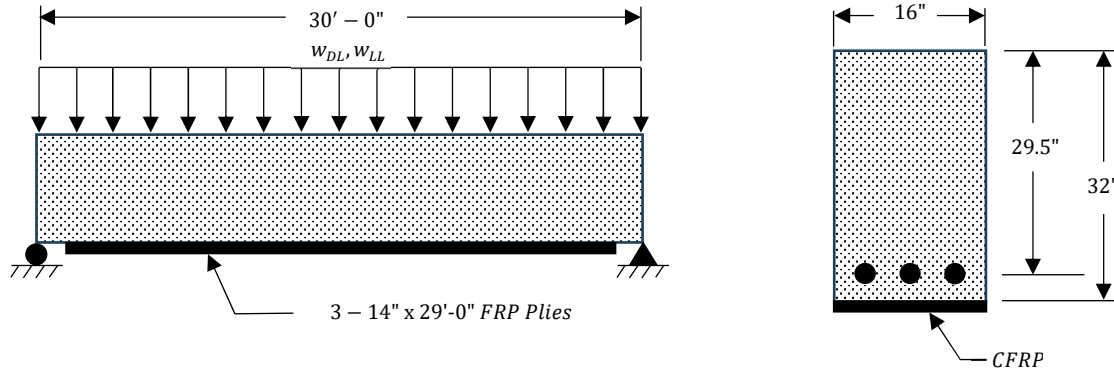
Elevation and Section of Idealized Simply Supported Beam with Externally Bonded CFRP Reinforcement
